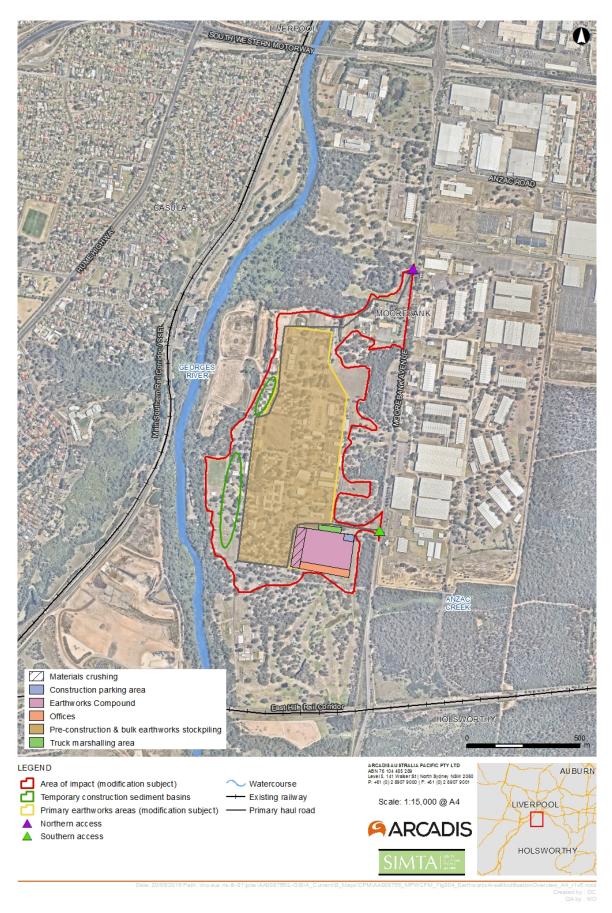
Proposed earthworks (MPW Concept Plan Modification)
